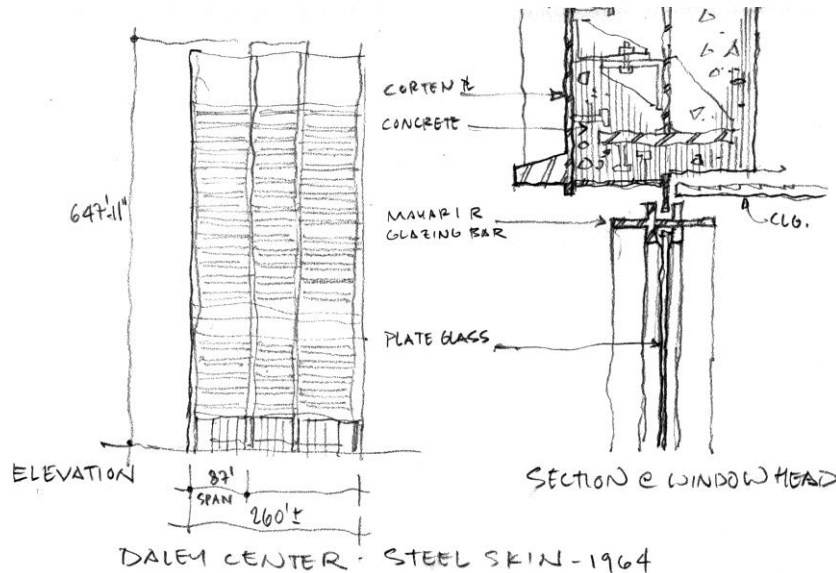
Daley Center, Chicago (orig. Chicago Civic Center), 1964. Joint venture C.F. Murphy Associates, Skidmore, Owings & Merrill and Loeb, Schlossman, Bennett & Dart. The Cor-Ten steel skin is structural, acting as formwork for the concrete encasing the steel frame, in an assembly similar to the steel cladding and composite frame of 860-880 Lakeshore Drive (1951), by Mies van der Rohe. The steel skin intentionally contributes to the stiffness of the tower against wind.
